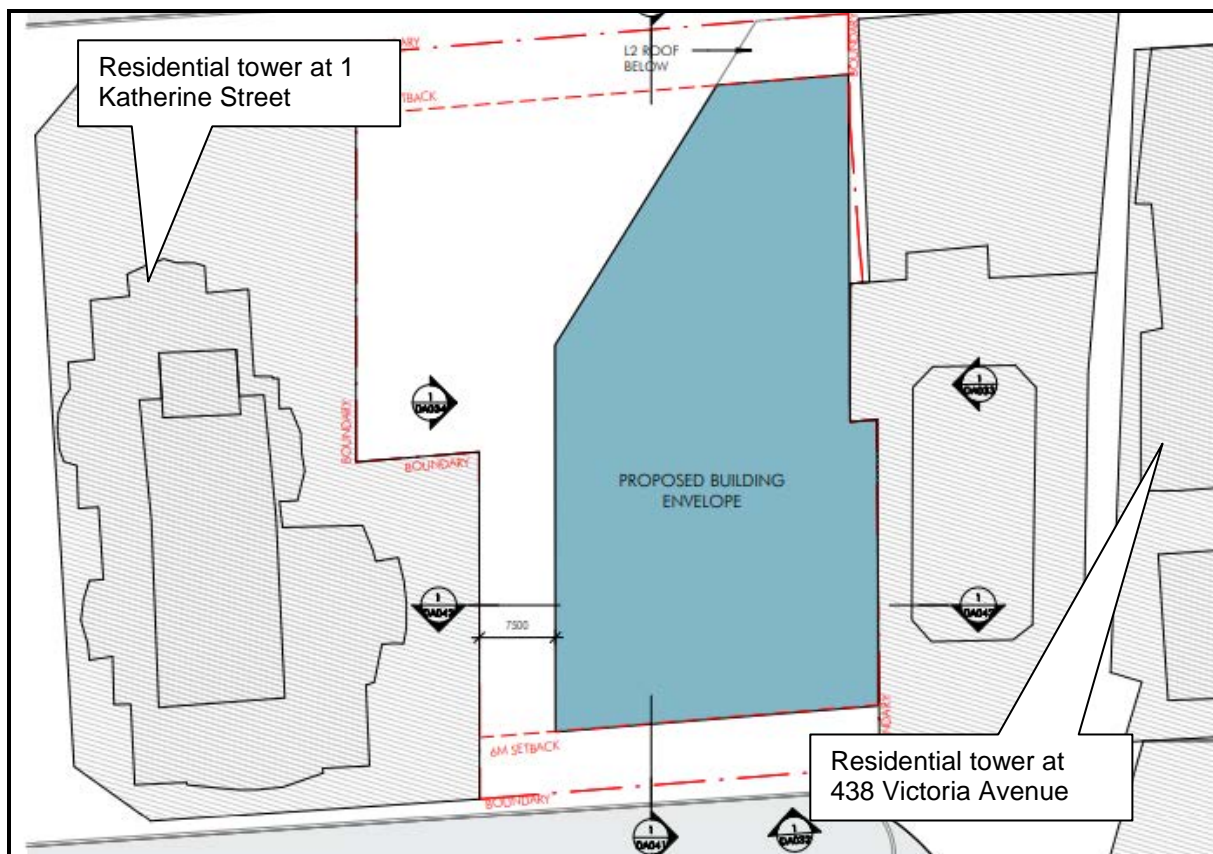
Relationship of proposed building envelope with nearby residential dwellings (extract from DA plans)
